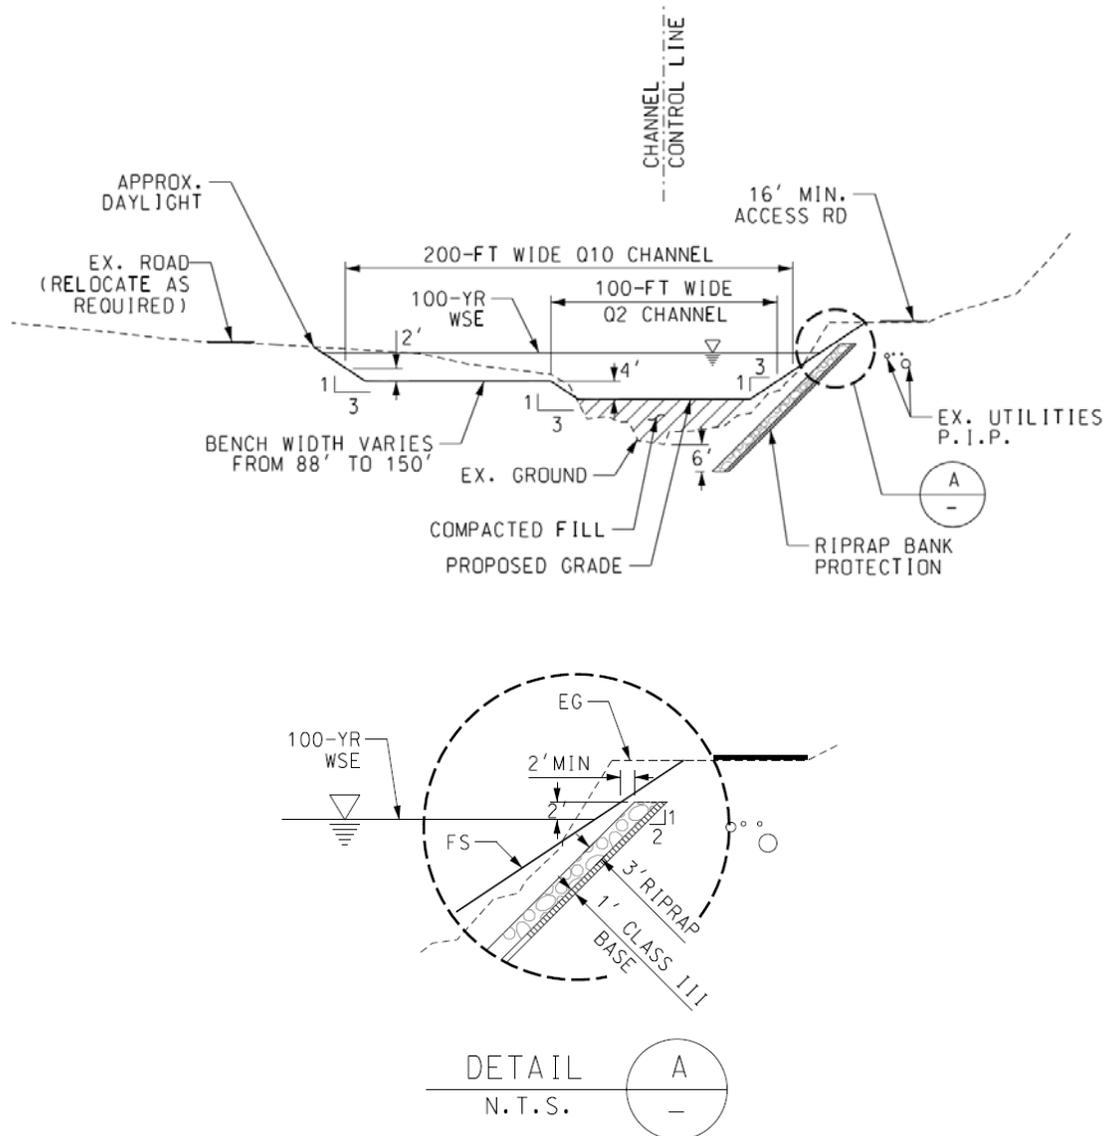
Typical Channel Design Section at Protected Bends (Alternatives 3 and 4)
